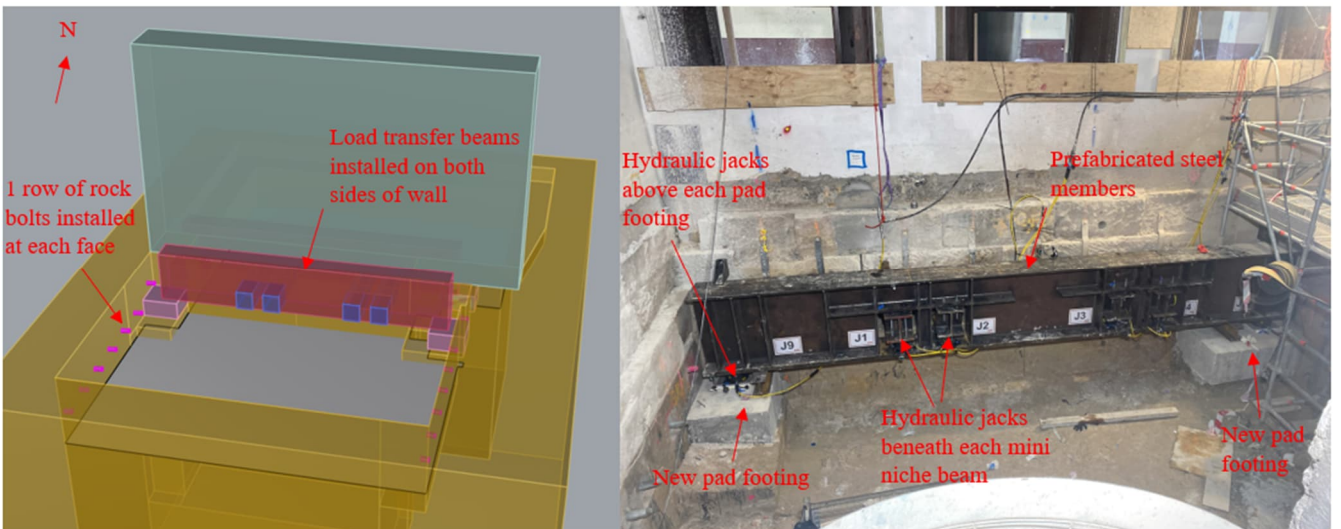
Load transfer beam and jacking system installation – 3D model isometric view (left) and site photography (right)
